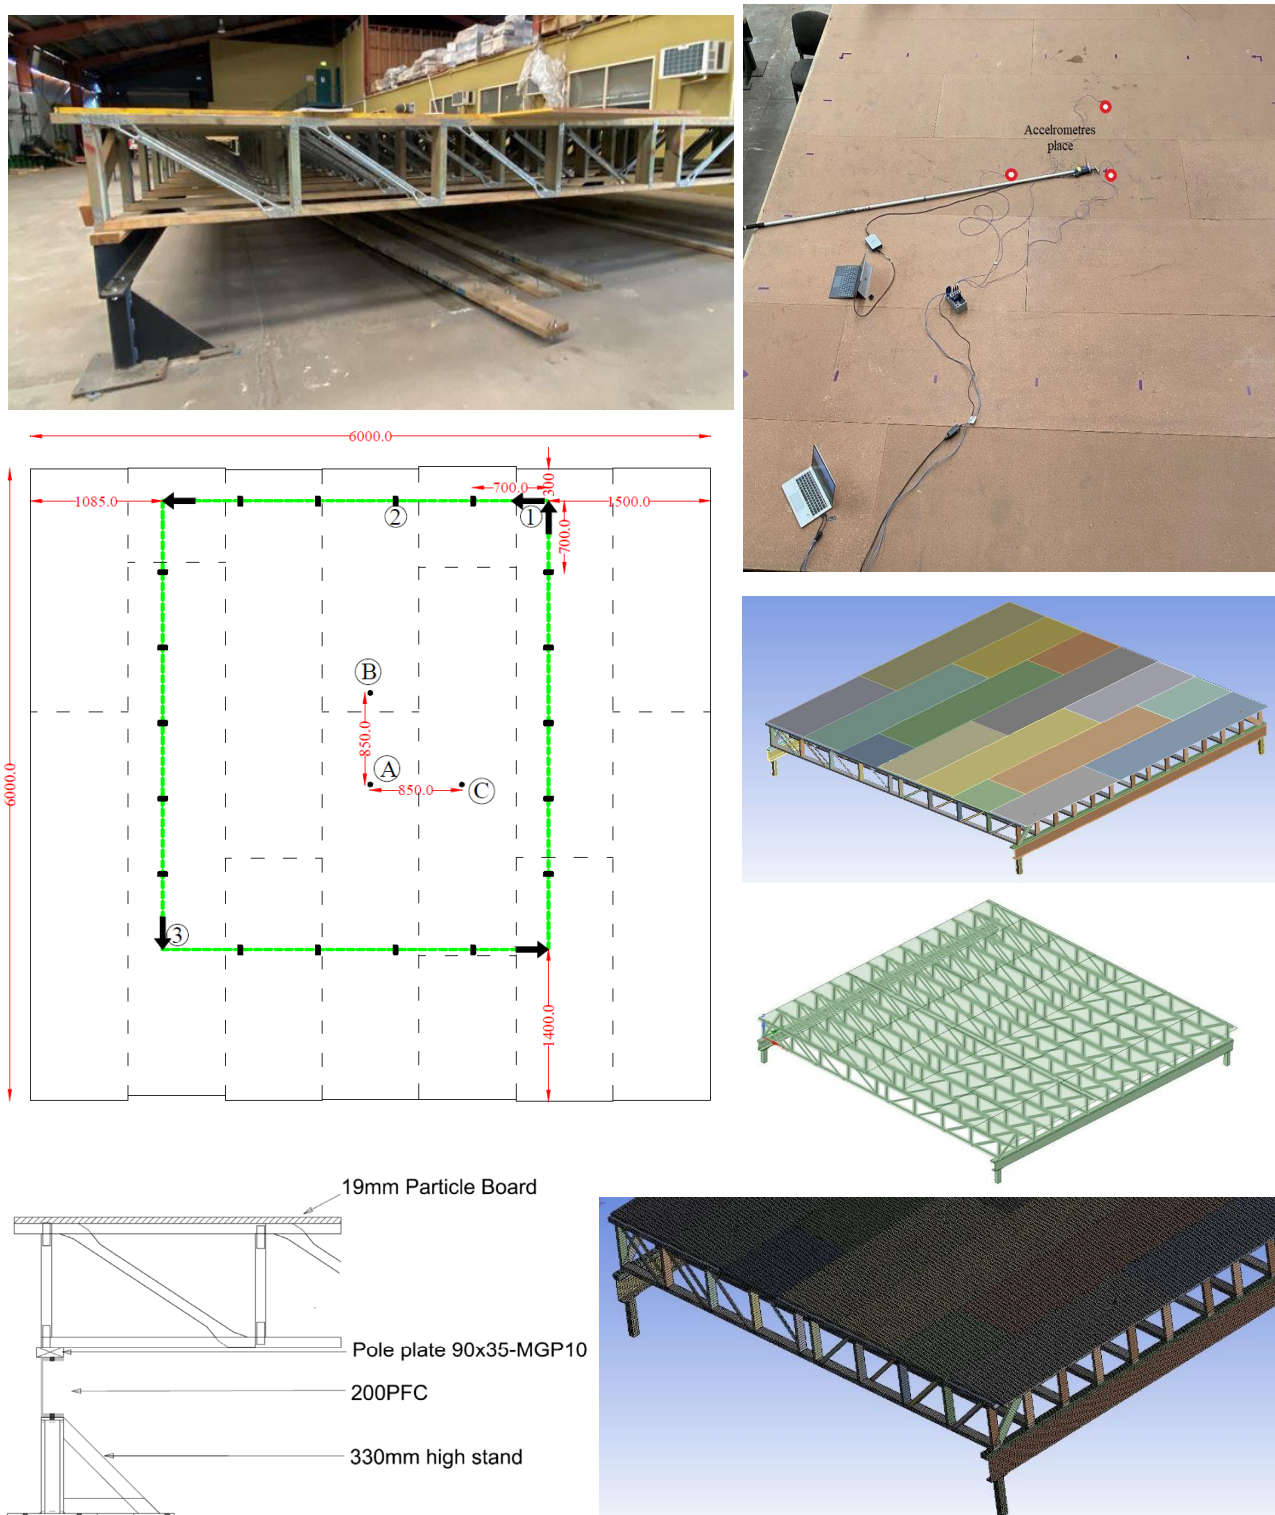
Case study II: the lightweight 6 m × 6 m floor system; plan layout; walking path (in green) showing dot points of step footprints; accelerometers A, B, and C locations (circled in red); and the FEA geometry and mesh.
